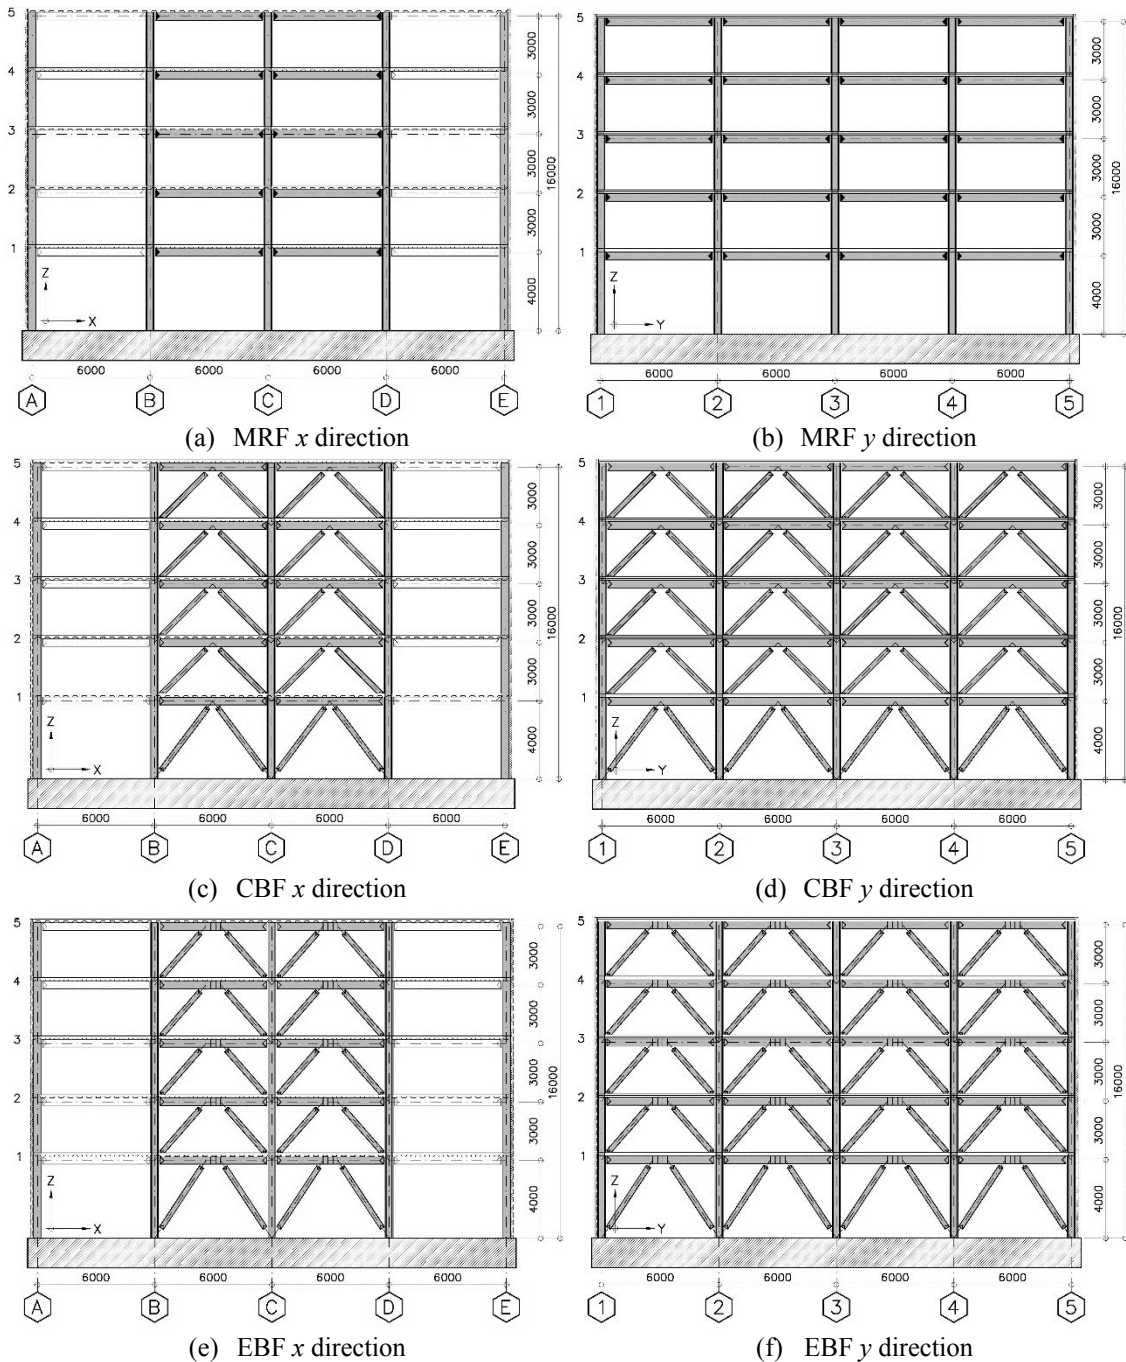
Elevation views of the 5-story 6×6 buildings
